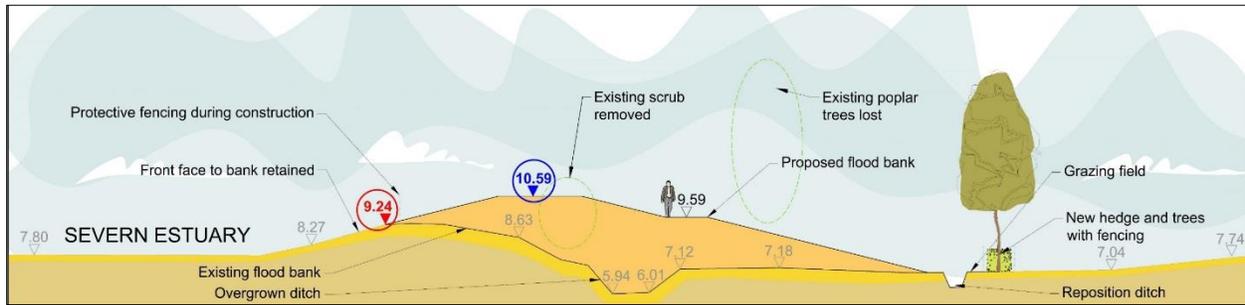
Typical Cross Section Through Currently Proposed Flood Defence Embankment
